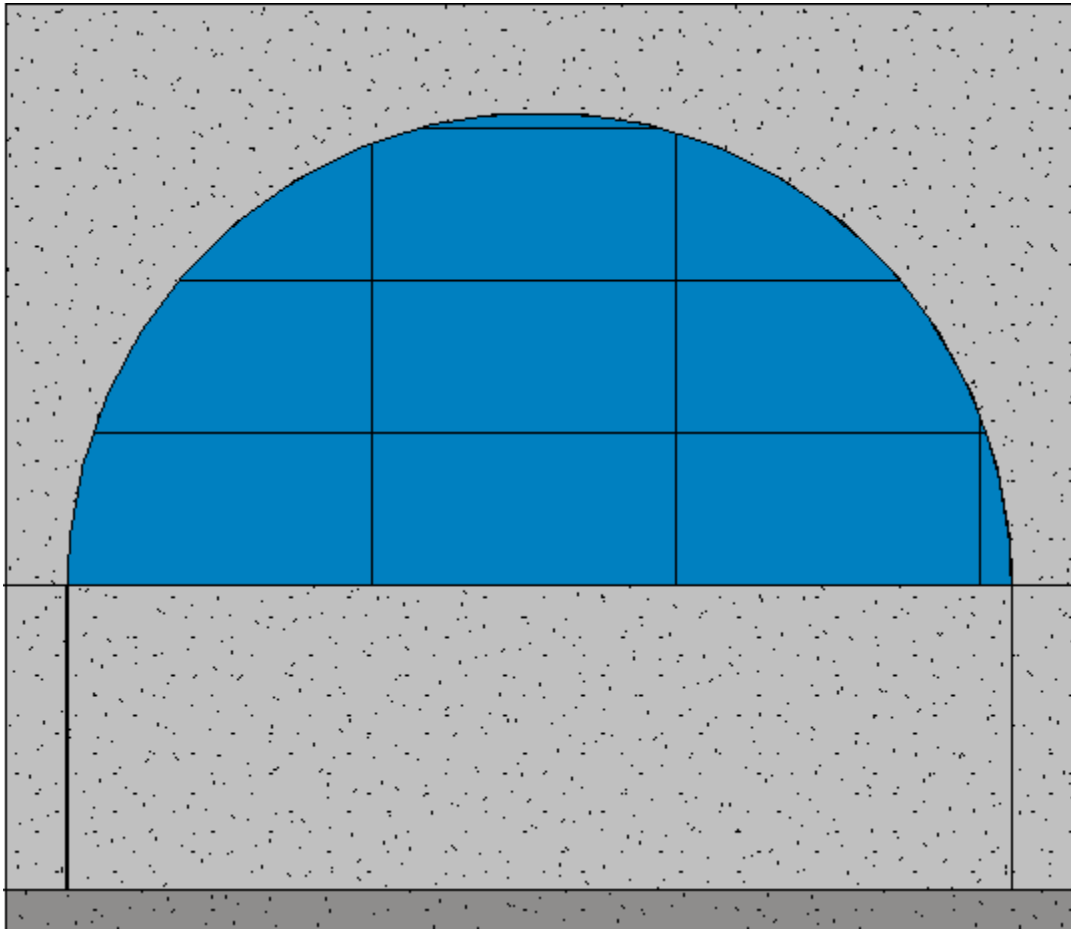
East Elevation illustrating bridging arch, which creates flat floor plane
